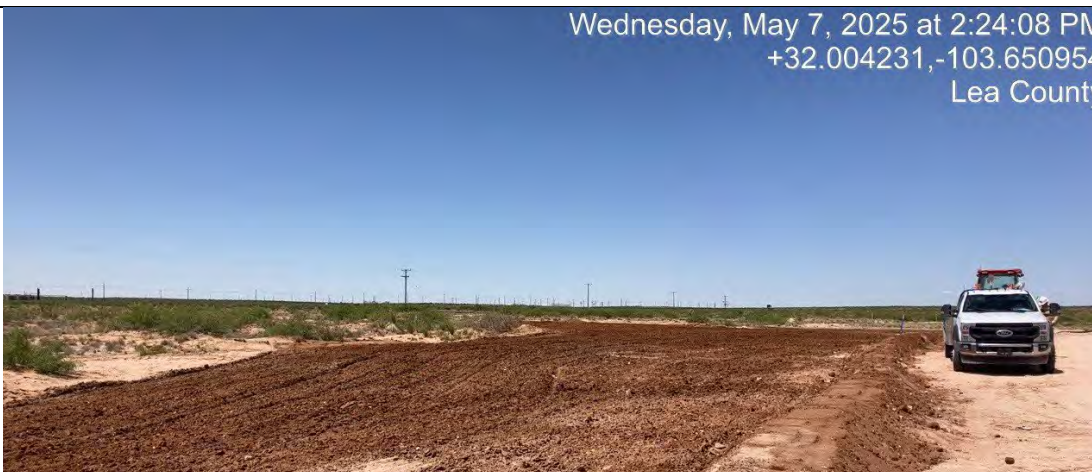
Surface reclamation viewing west-southwest from the northeast extent.
